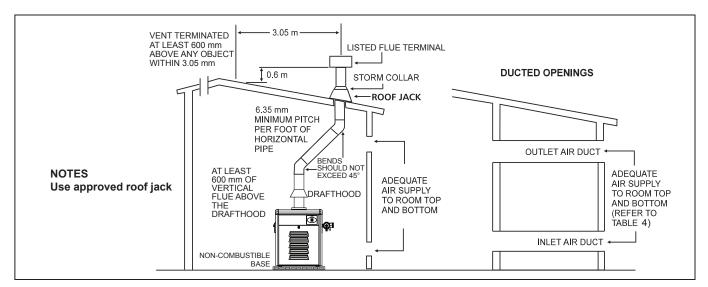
Indoor Installation Venting or Outdoor Shelter Venting
